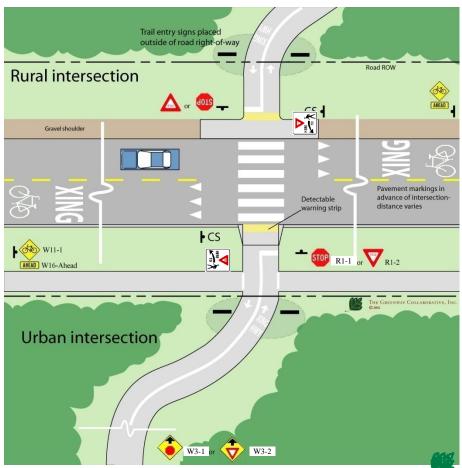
D. Trail Signs at Road Intersections Trail View
